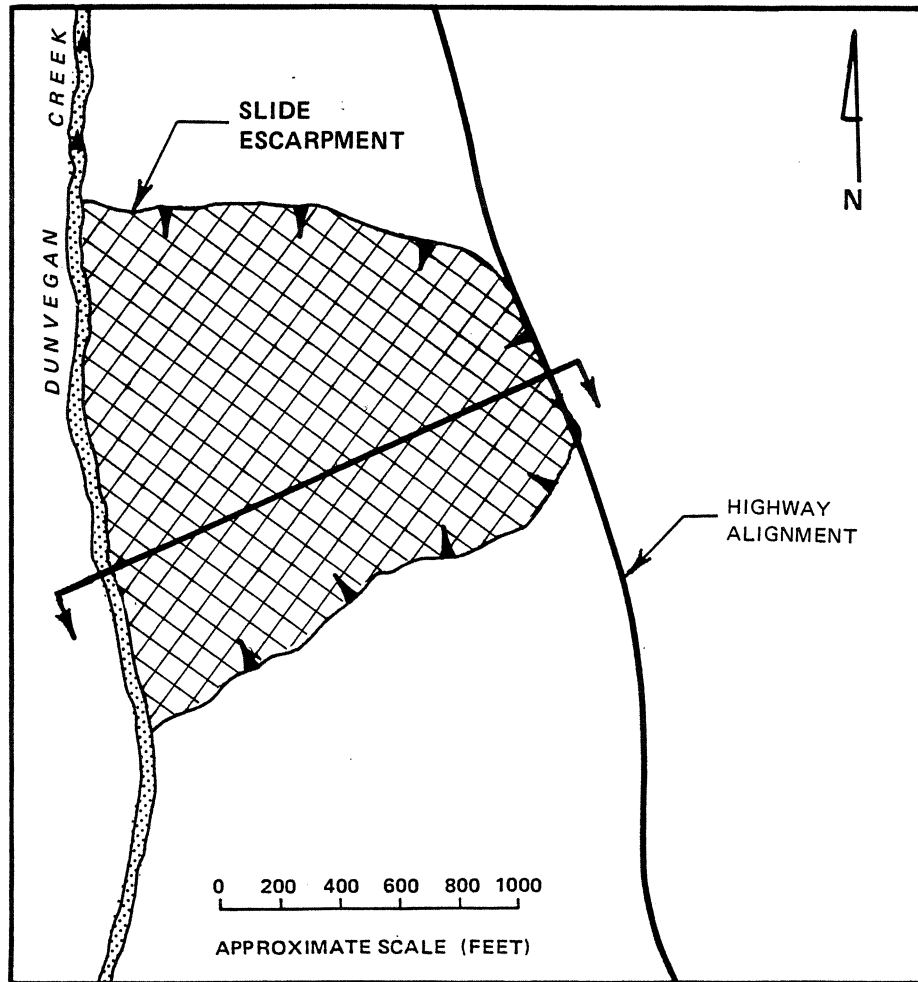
DUNVEGAN HILL – SITE PLAN
